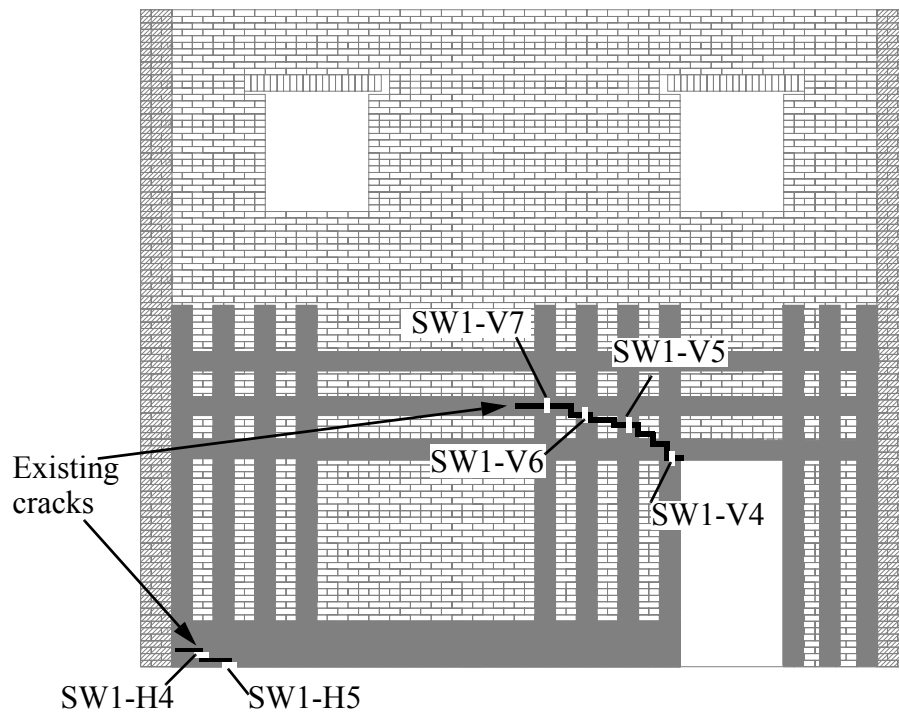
Locations of strain gages placed on the external reinforcement applied to Wall 1.
